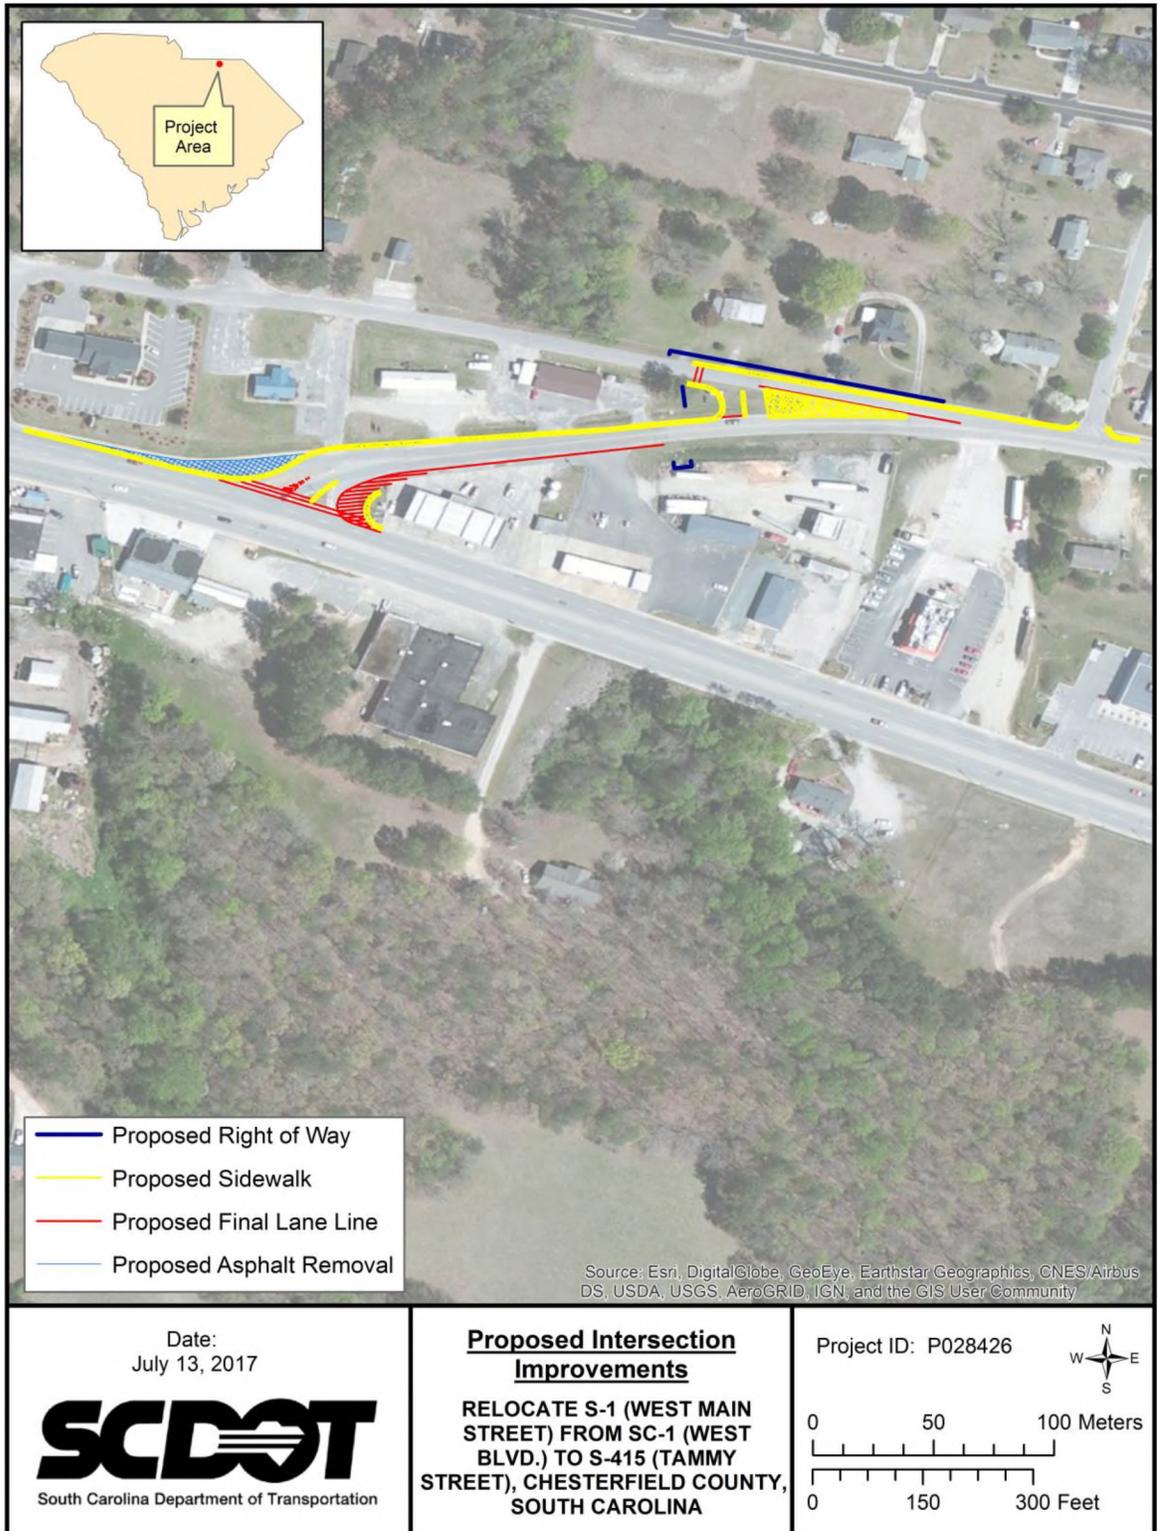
S-1 from SC-9 to S-415 Intersection Improvement Project Plans.
